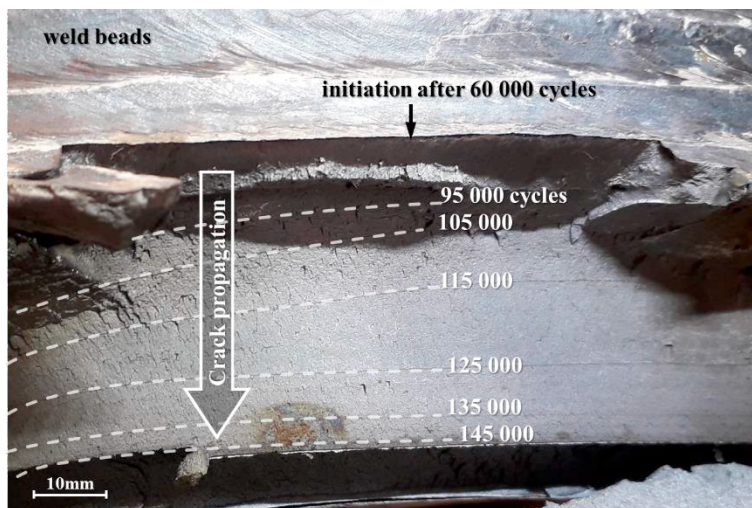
Example of beach mark lines in the fracture surface of an X-joint.
